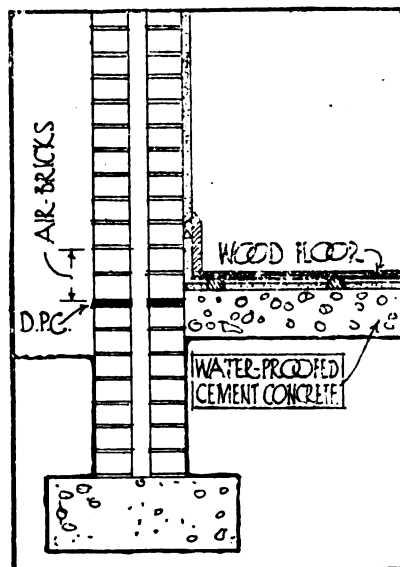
11½ in. cavity wall. Boarded floor fixed direct on waterproofed concrete.
